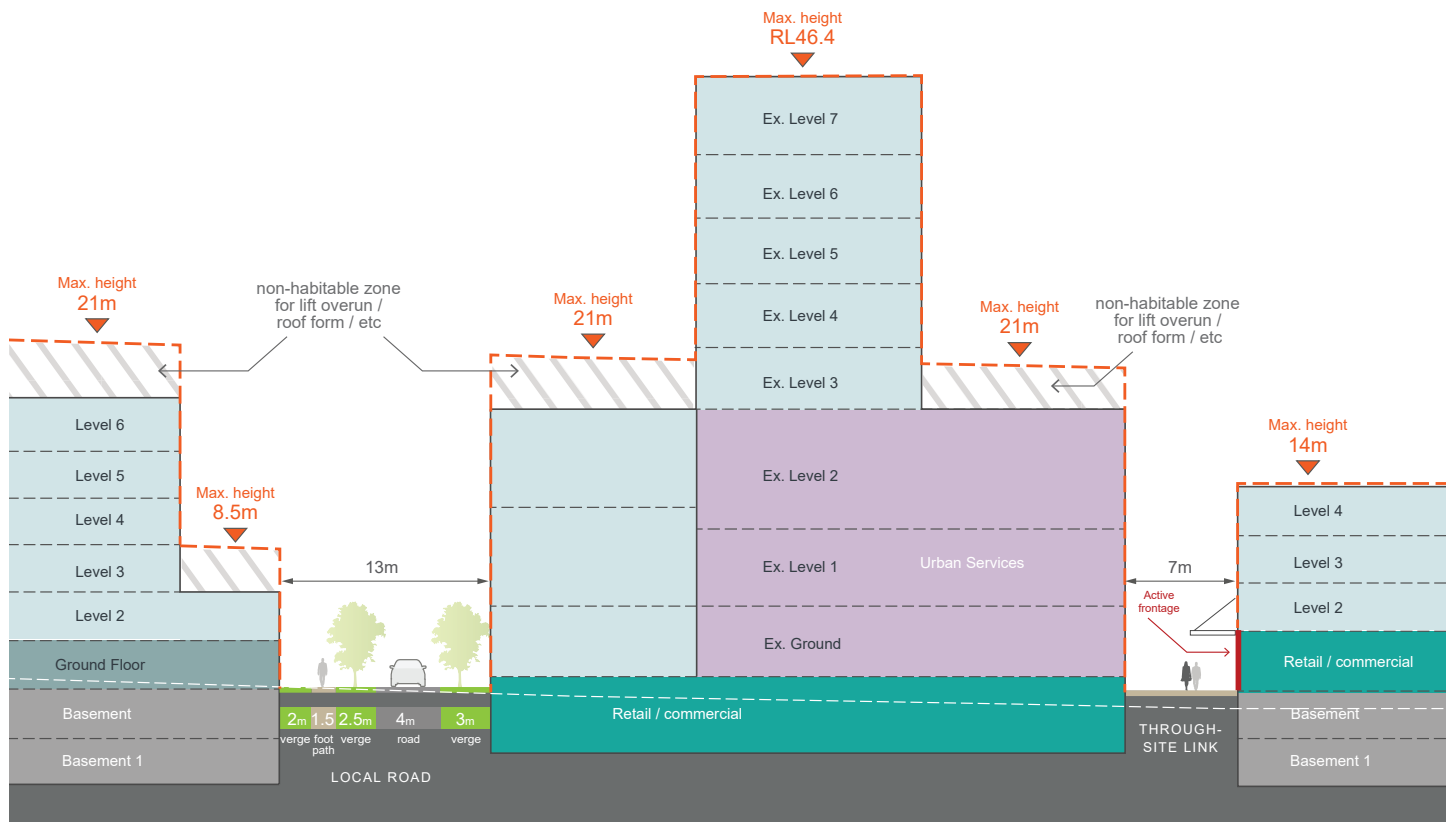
Section 5: Looking east towards 6 storey development, existing Central Roasting Hall and 4 storey development
